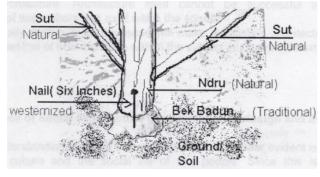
Building column (post) details in vernacular terms –House Two (Bakok)
